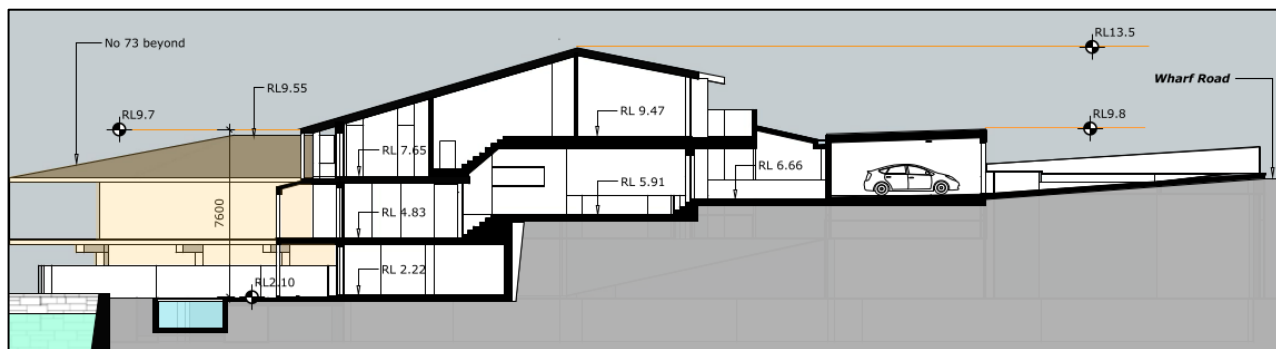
Section of existing dwelling (as approved via LDA2005/0129)
